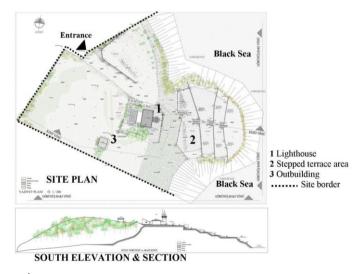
İğneada Lighthouse site plan and section (survey drawing) (Zağra, 2016).
